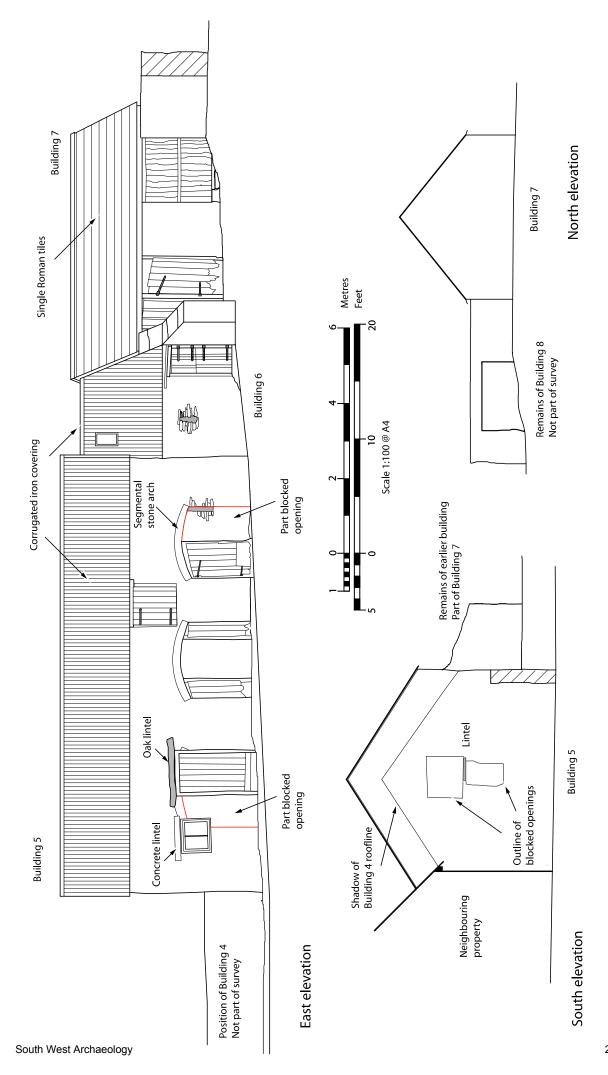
The Shippon and attached buildings (Buildings 5, 6 & 7), elevations.
